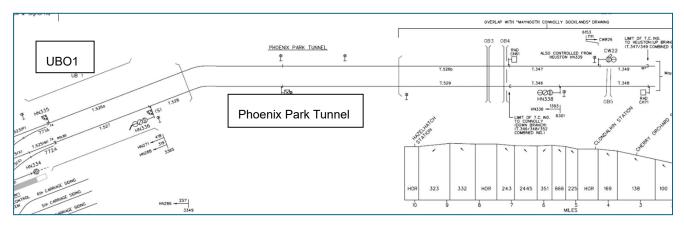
Existing Track Layout in this area UBO1 to PPT (from Scheme Plan S.221/121)
